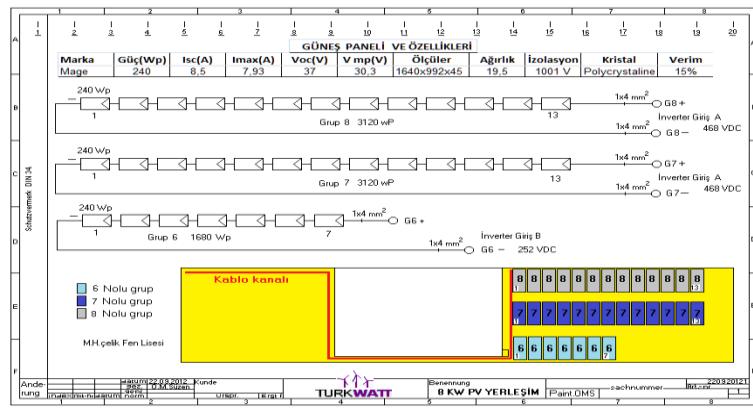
Connection and placement scheme of solar panels belonging to 8 kW
